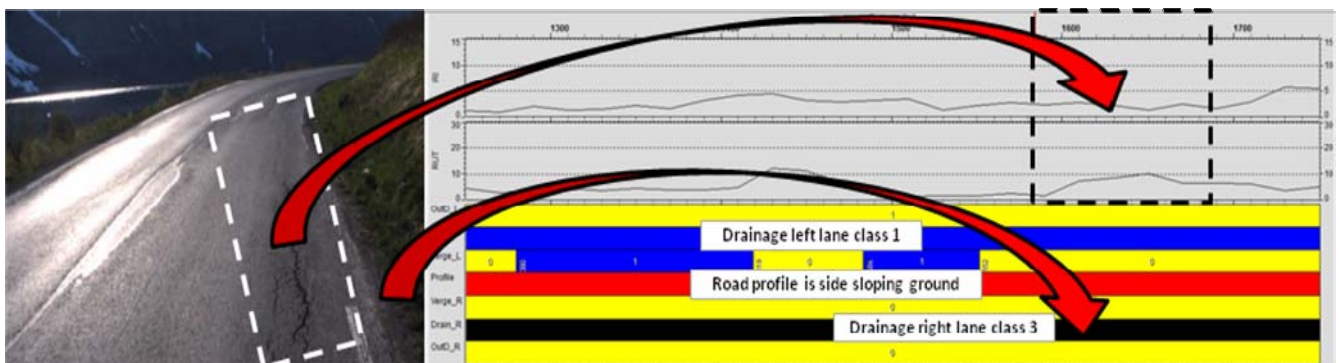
Drainage problems and severe damages on the pavement on the right lane. Profilometer data (upper arrow) shows low values which do not reflect the actual condition of the road. (chainage 1580-1680m).
